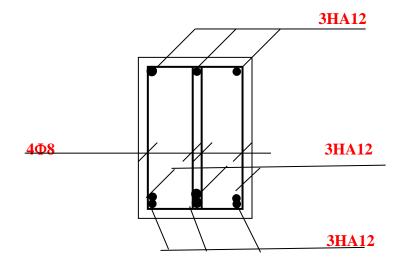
Reinforcement diagram for 30×60 main beam (no need).
